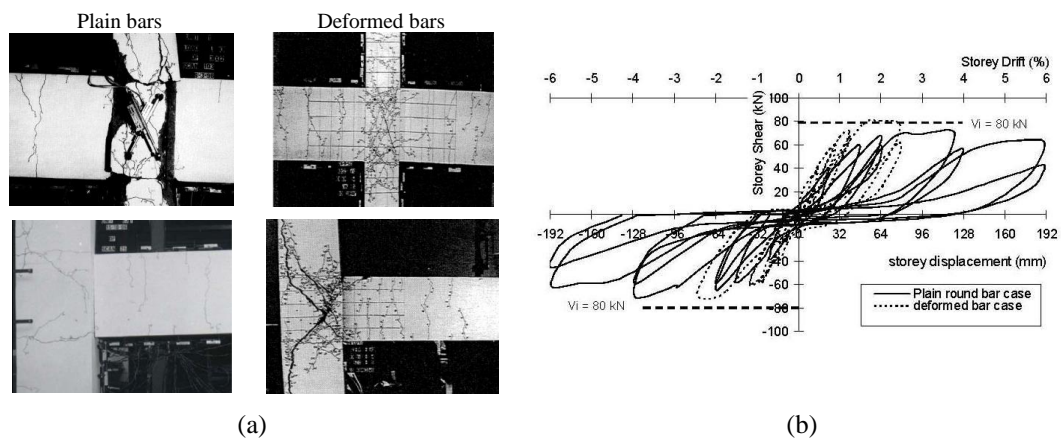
Comparison between beam-column joint specimens with plain and deformed reinforcing bars [101]: a) final damage state in beam-column joint specimens; b) storey shear versus storey displacement for the interior joints.
